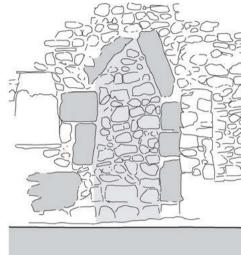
Blocked doorway in the rear wall of room (g) in House I 4,2.
